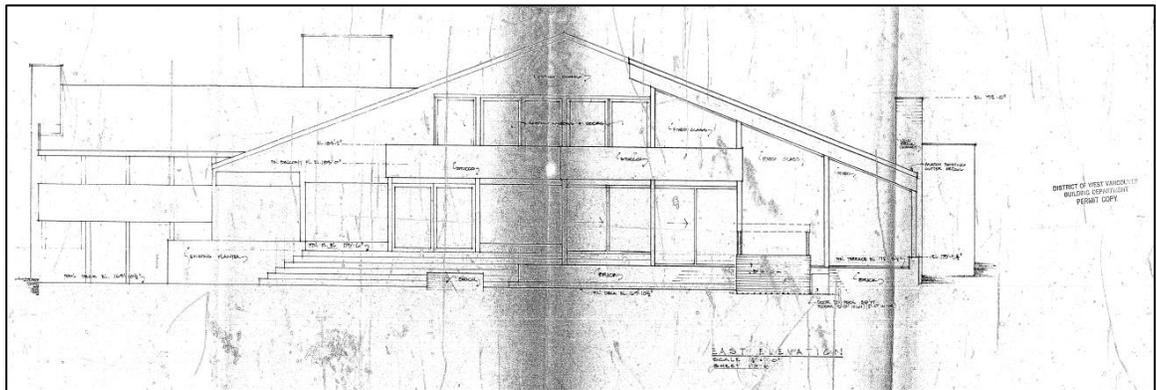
East Elevation (rear) of the Hall Residence from original building permit plans
